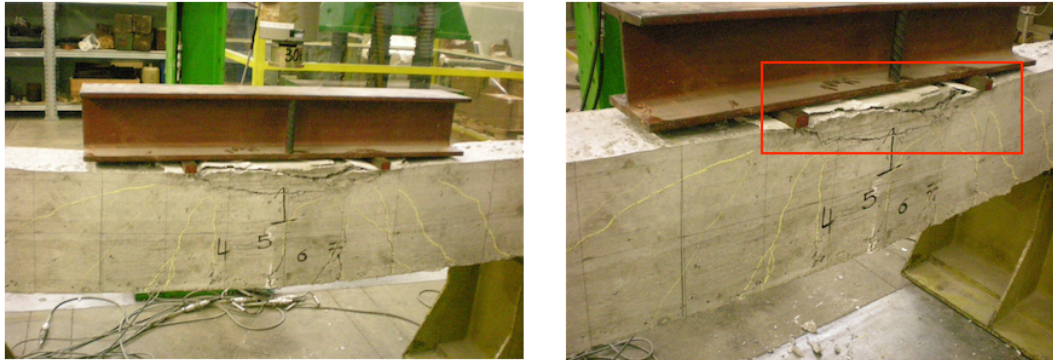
Bending Failure: Concrete cracking – “A1” series.
